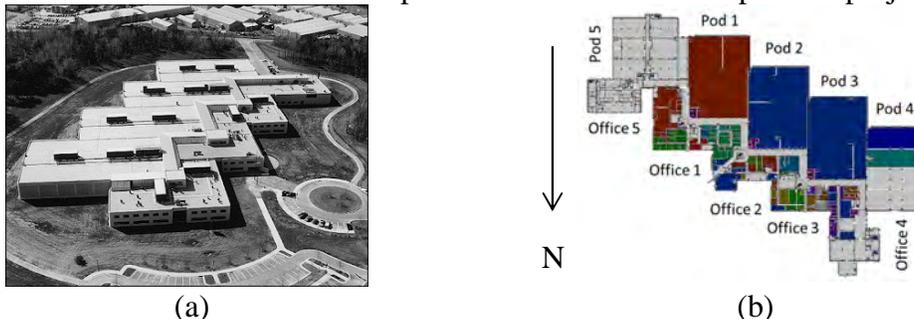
(a) Aerial view of MSC in 1980s (without Pod 5 and Offices 5) (www.mnh.si.edu); (b) Floor plan of MSC
